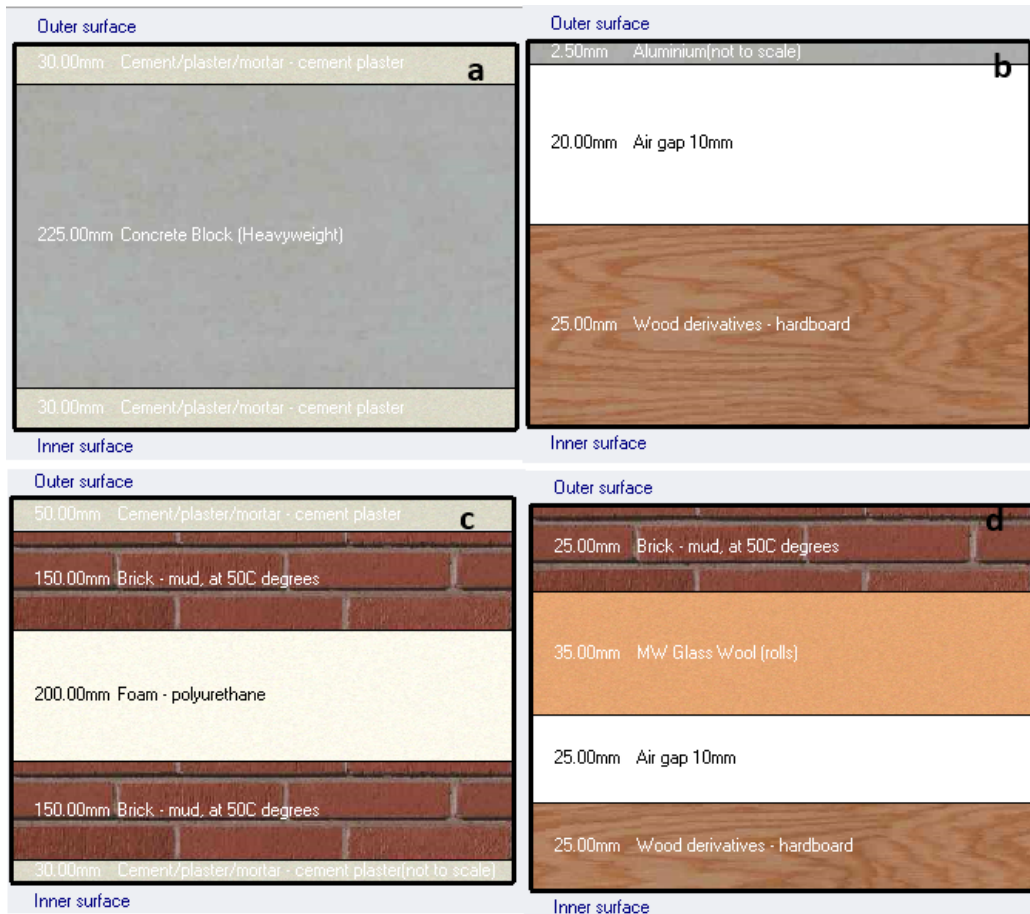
Cross Section of Materials: Wall (a), Roof (b), Optimised Wall (c), Optimised Roof (d)
